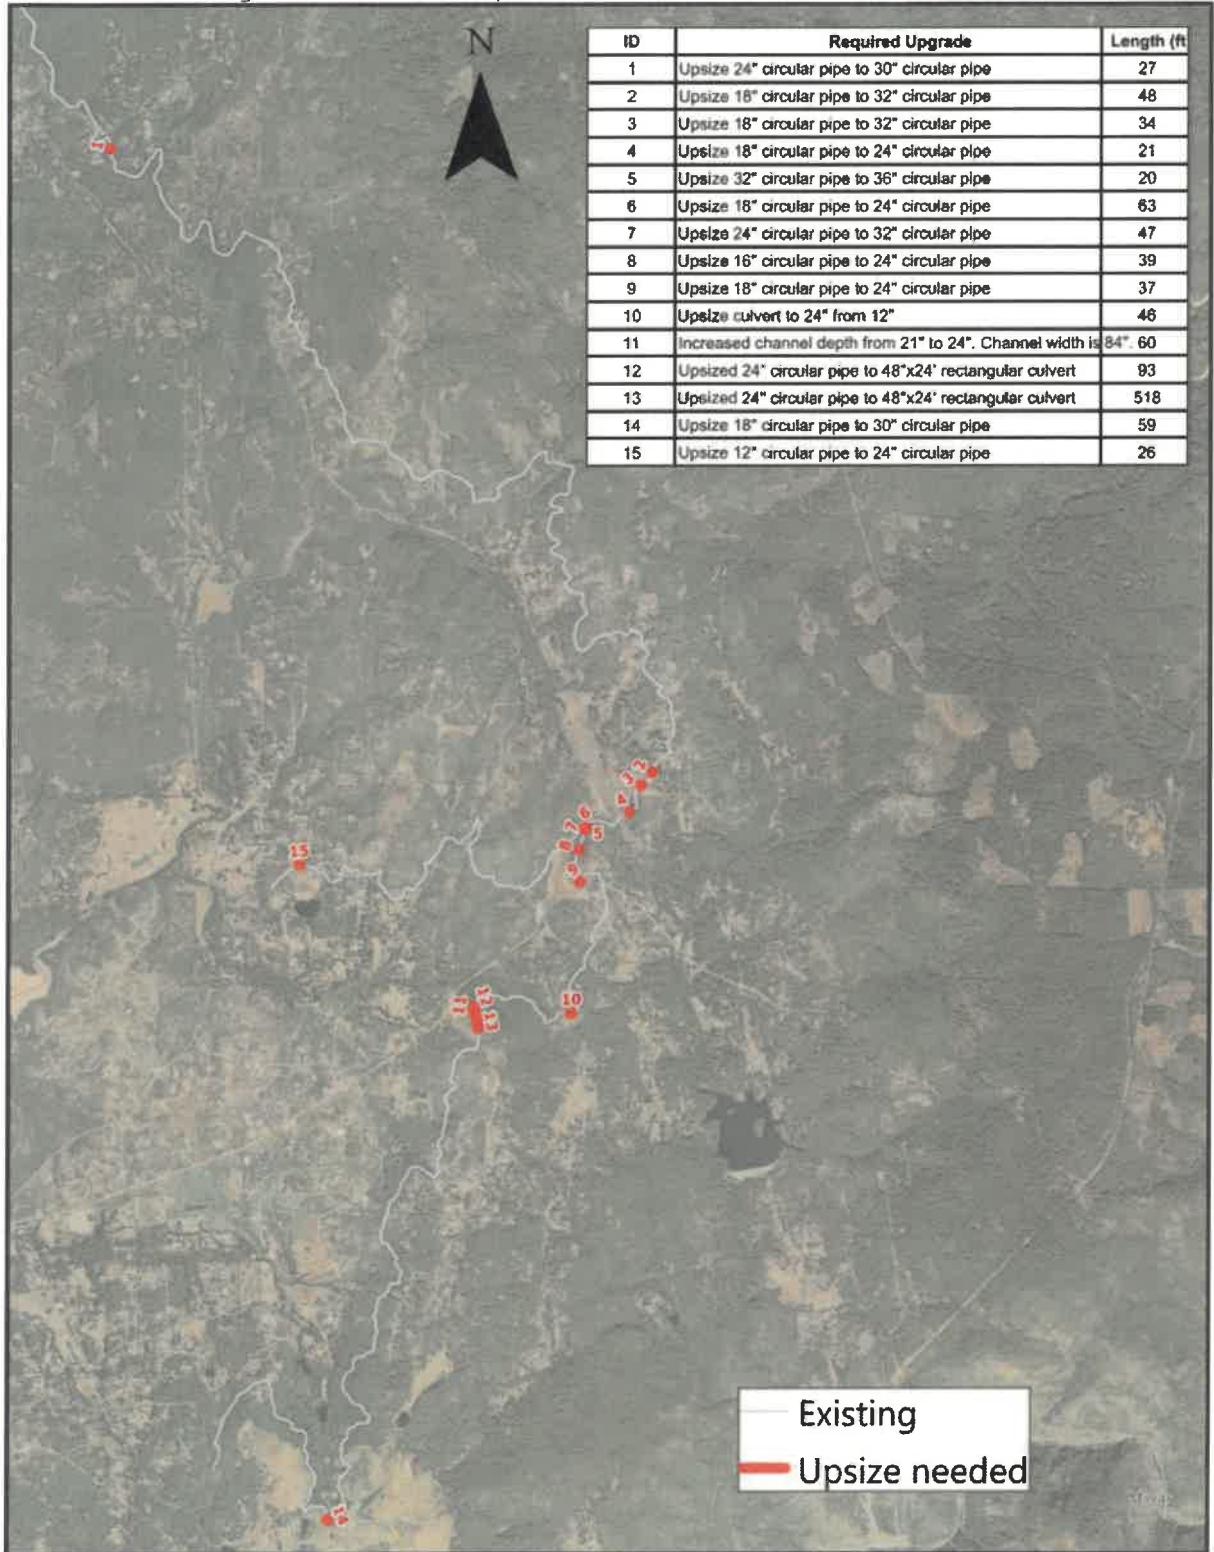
DOHC Required Modifications for Alternative 3 - Shotcrete Lined Canal
